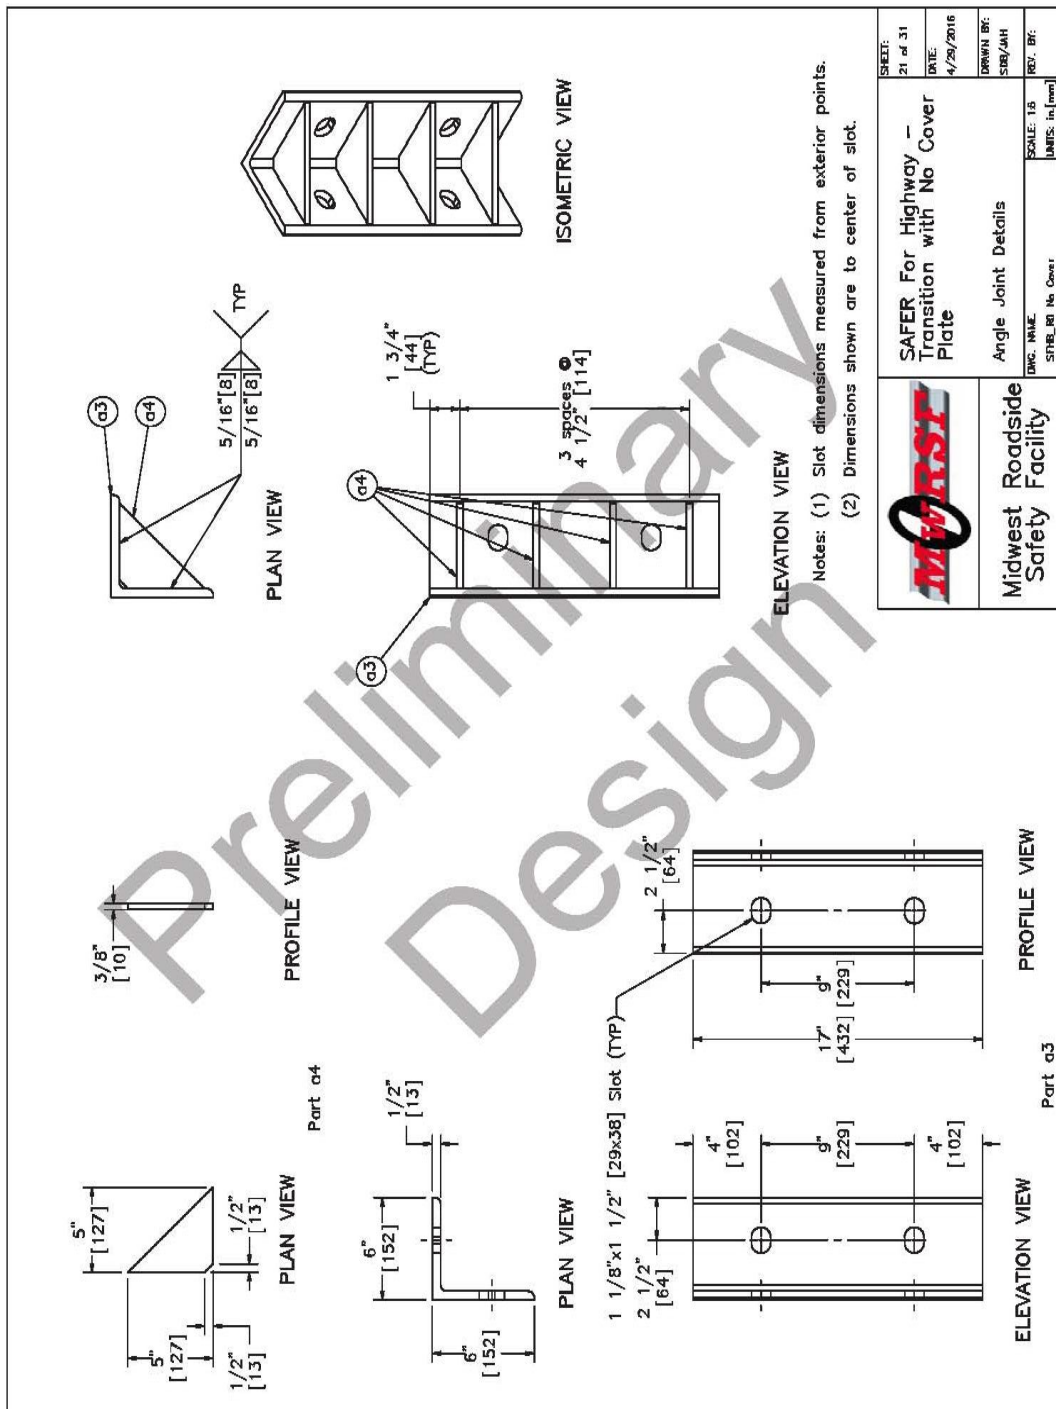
Angle Joint Details, No Cover Plate, RESTORE Barrier Transition
